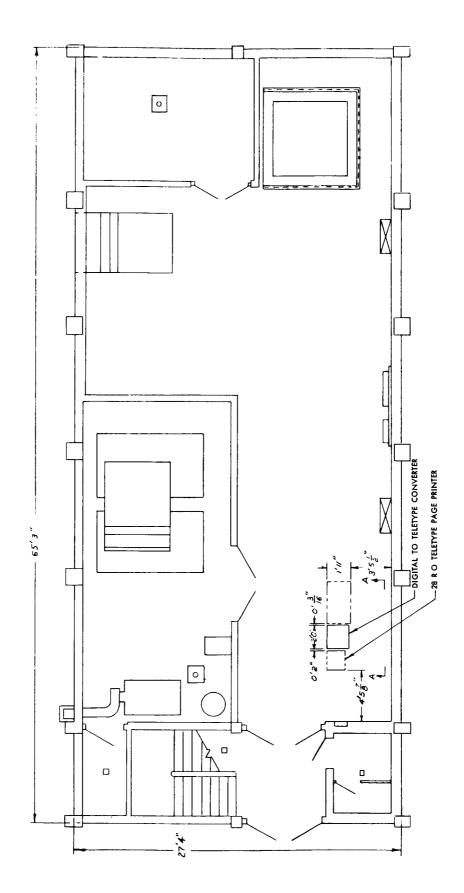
White Sands FPS-16 Radar Building - Layout Diagram
